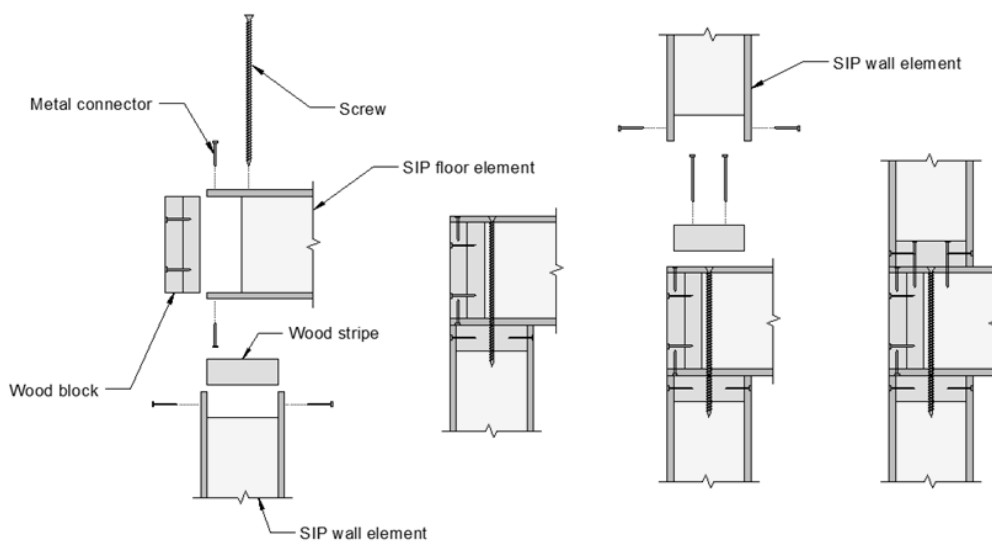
Wall-to-floor-to-wall connection with screws and wood stripes between SIPs.
